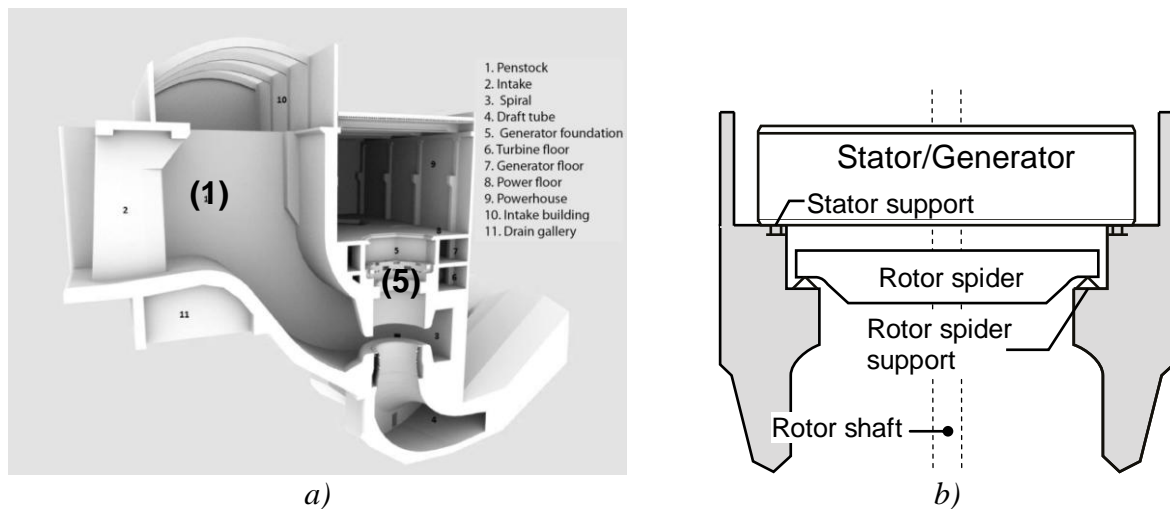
Schematic layout of a hydropower station (a), from (Paavola, 2011), and a vertical cross-section of the concrete support structure (b).
